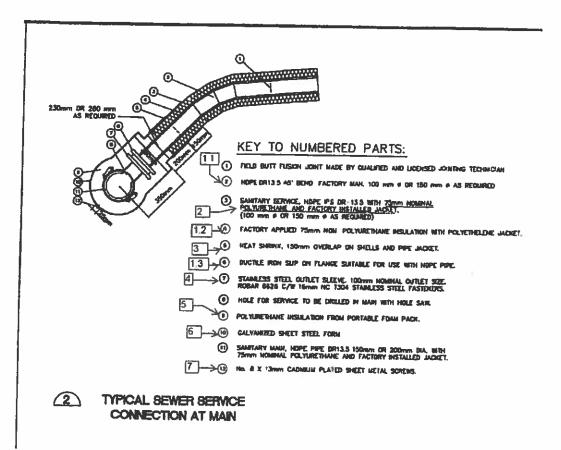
Detail 2 - from Drawing C-332 - Sewer service connection Kit at main
